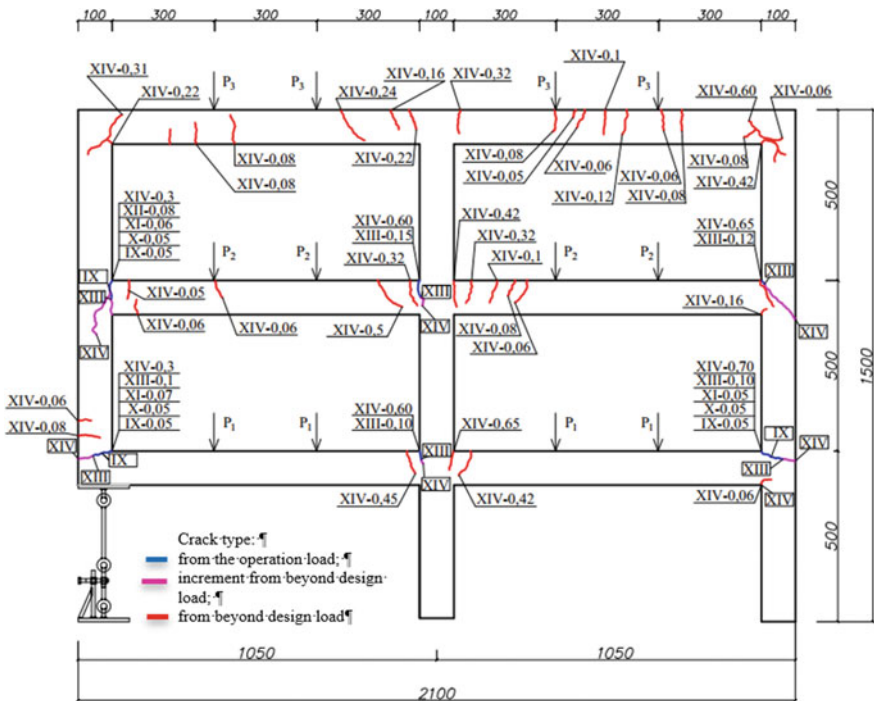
Design of formation and opening width of cracks of all types in the structure of the FR-2 frame after applying a special load
